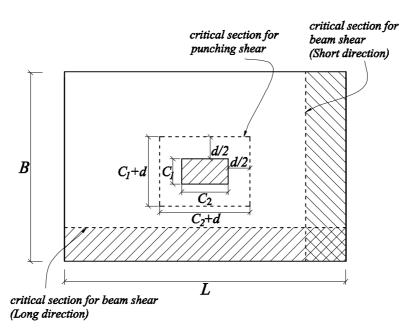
b: Critical sections for punching and beam shears (rectangular footings)
